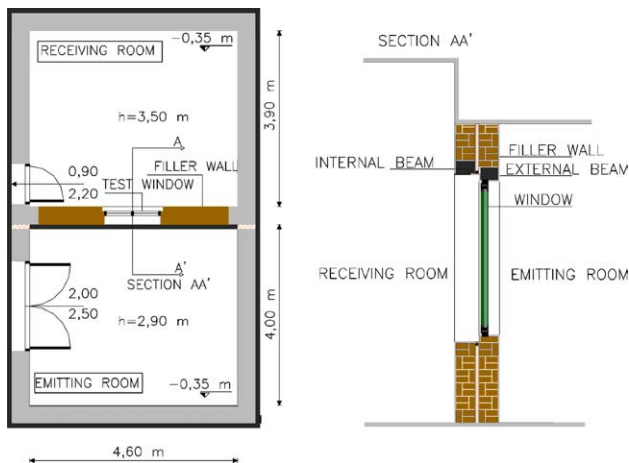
Coupled reverberating rooms: rooms map and sample wall section.
